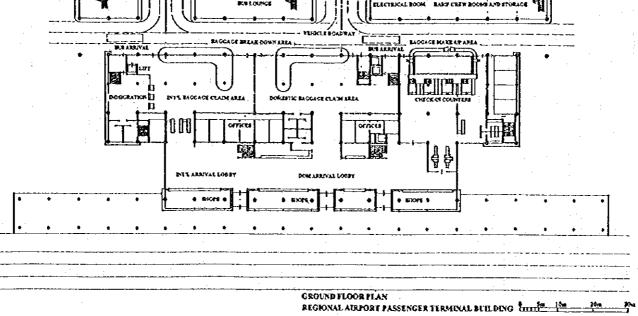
Passenger Terminal Building - Floor Plans
